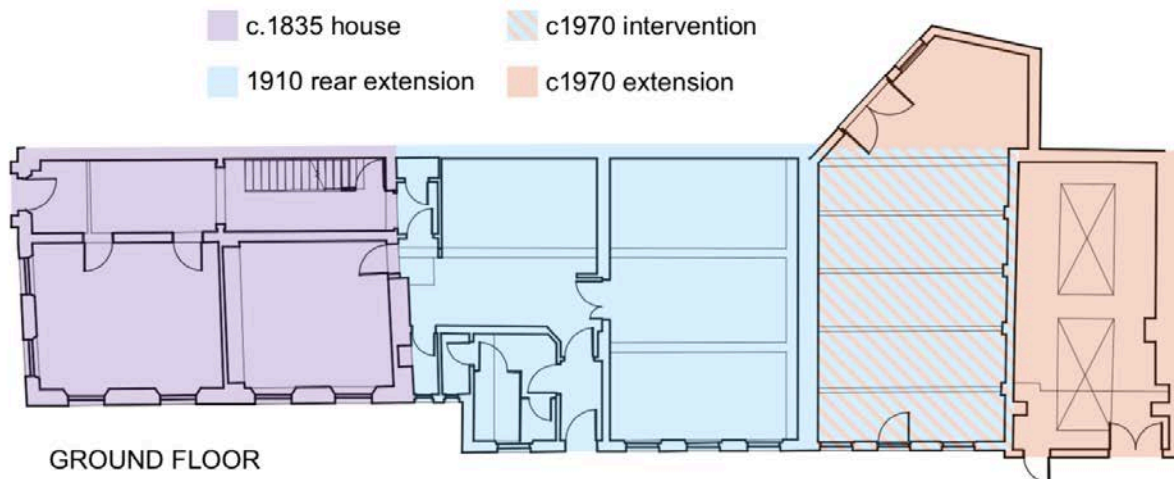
Basic phased ground floor plan of De Grey House. Note – c.1970s extensions (orange) in separate ownerships.
